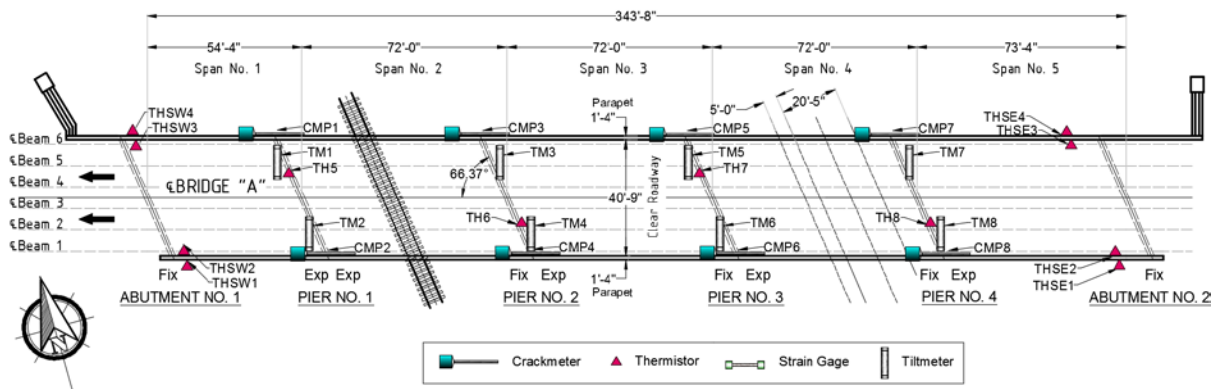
Locations of pier cap and road surface instrumentation on SH-3 north bridge
